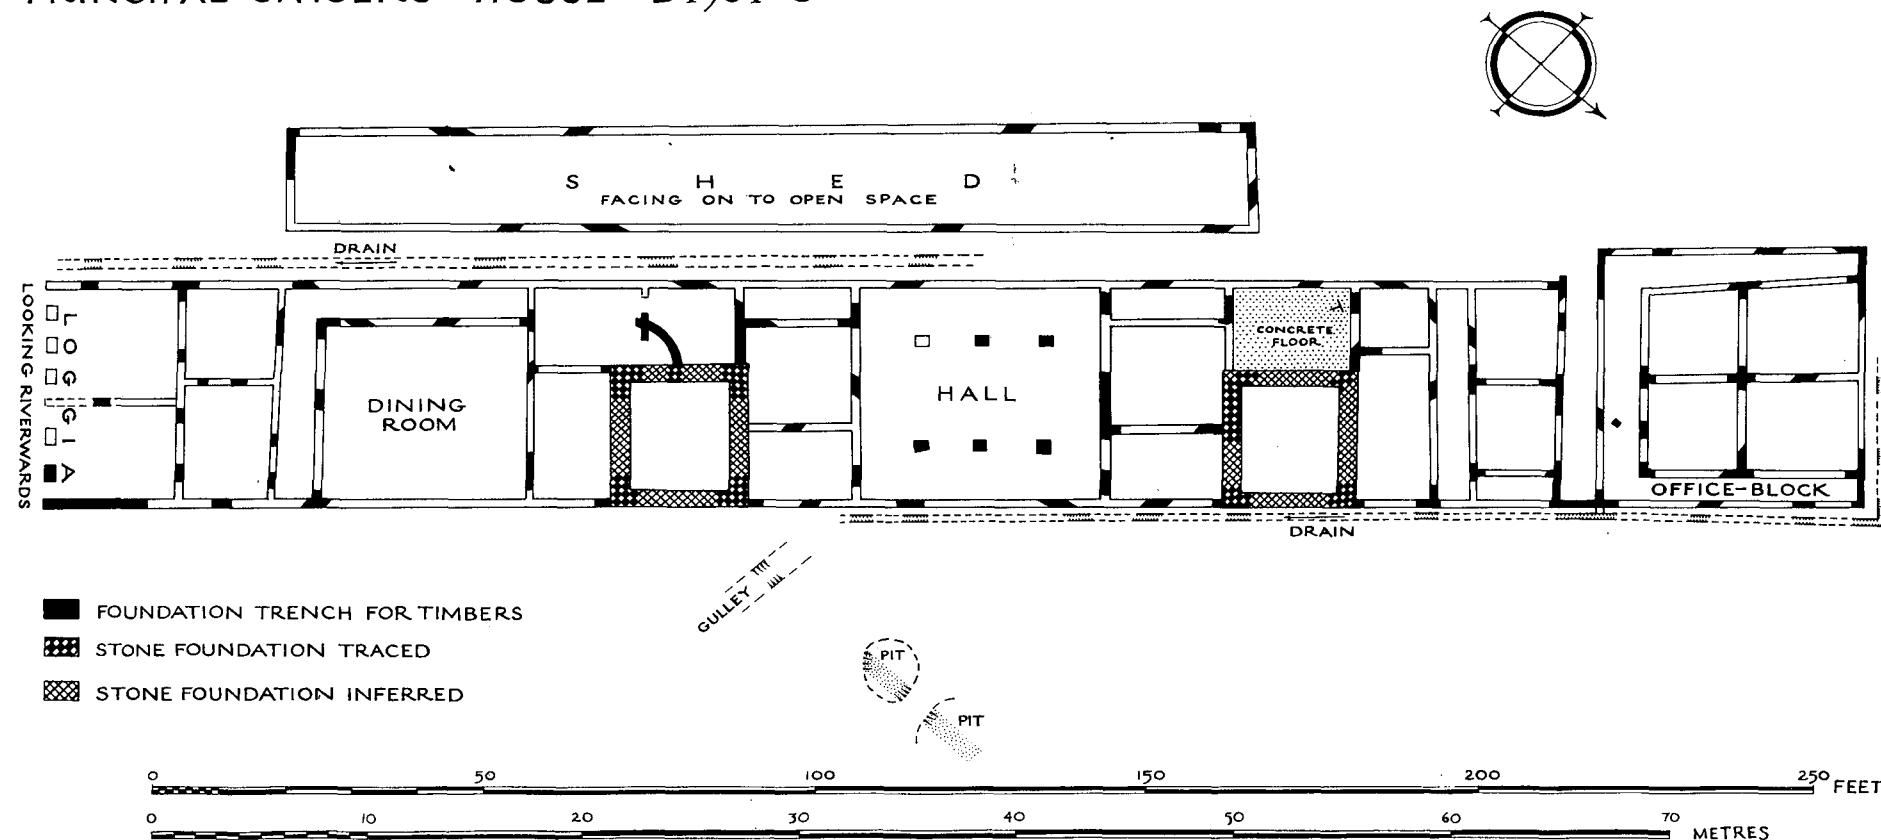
The Officers' temporary Compound, plan of Officers' House. Scale, 1:363.
